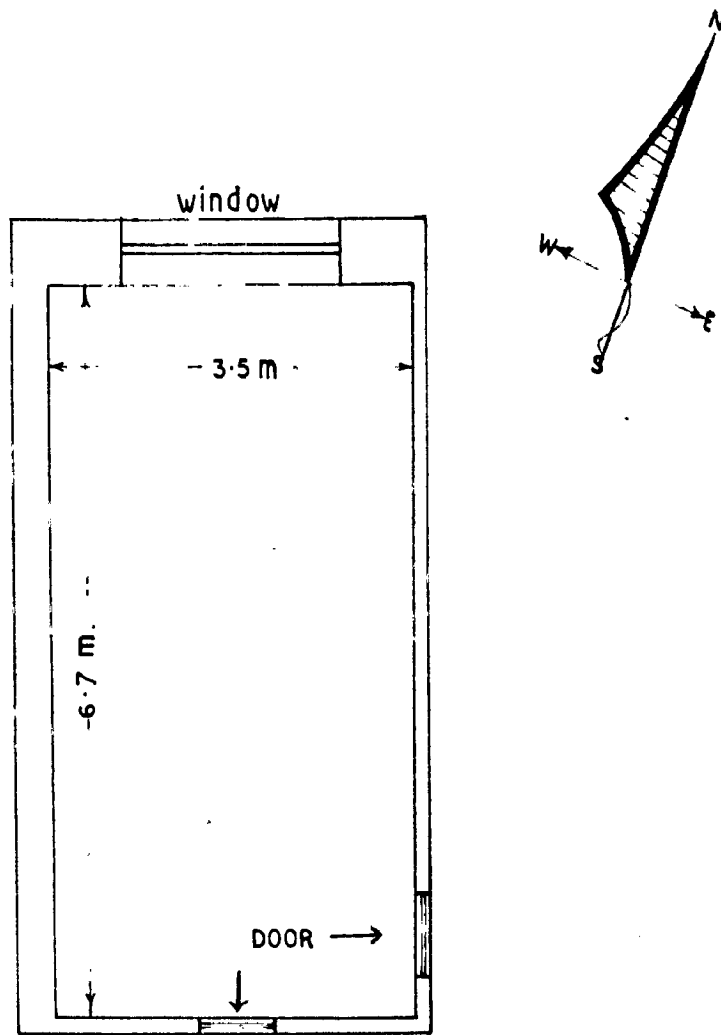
PLAN OF OFFICE ROOM USED FOR SOLAR HEATING
